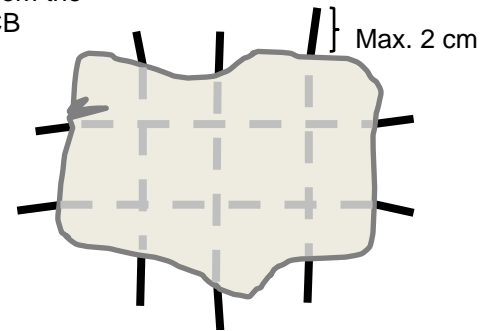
Reinforcement bars may not jut out more than 2 cm from the concrete
